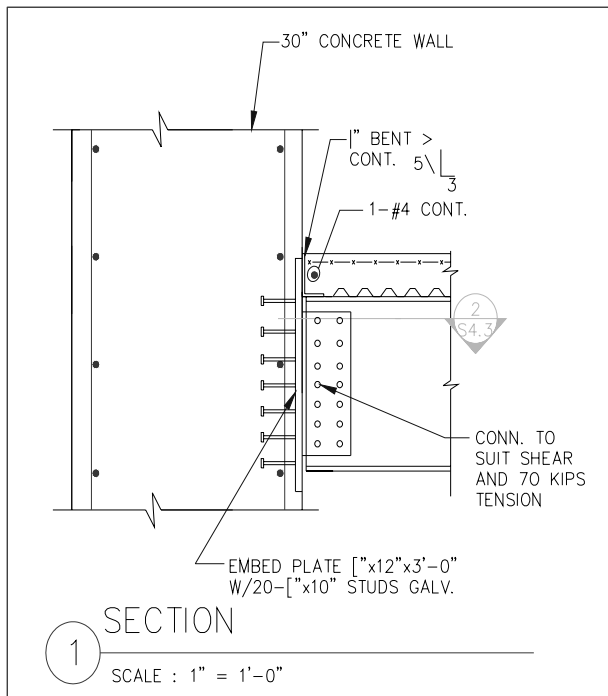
MUSEUM CONNECTION INTO FRONT FAÇADE (EMC)
